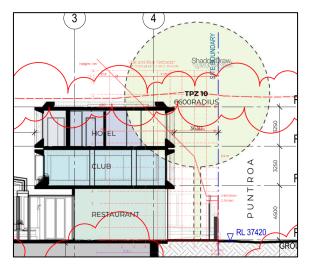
extract of the architectural plans (Section 1) with Clause 55.04-1 setback line added by Council
